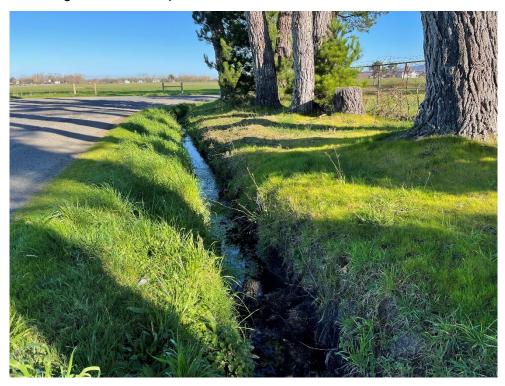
Drainage ditch running parallel to 5^{th} Street on east side, adjacent to planted stand of Monterey pine.
